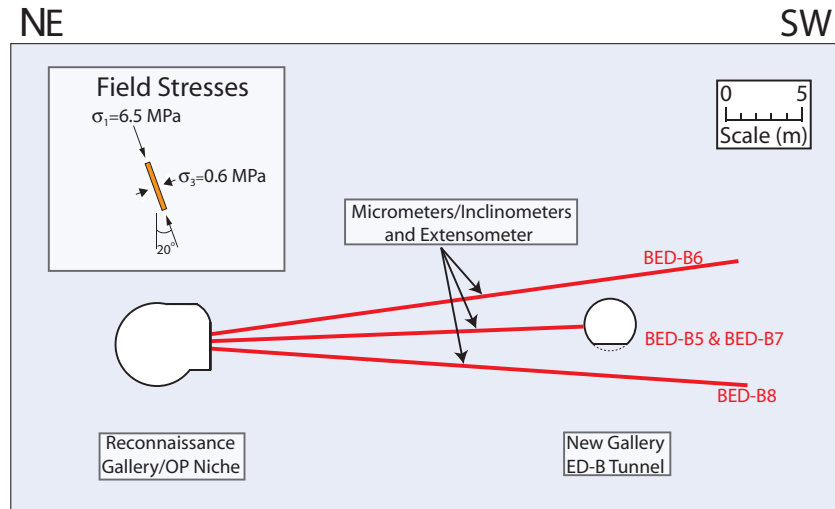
Elevation view looking southeast in the direction of excavation advance.
